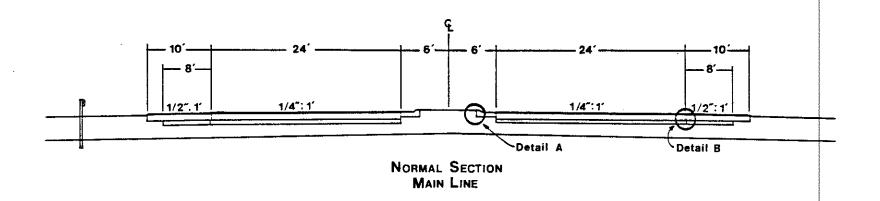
Typical Section and Detail for Main Line Section STA 915+00 to STA 1051+50 (Section E).
